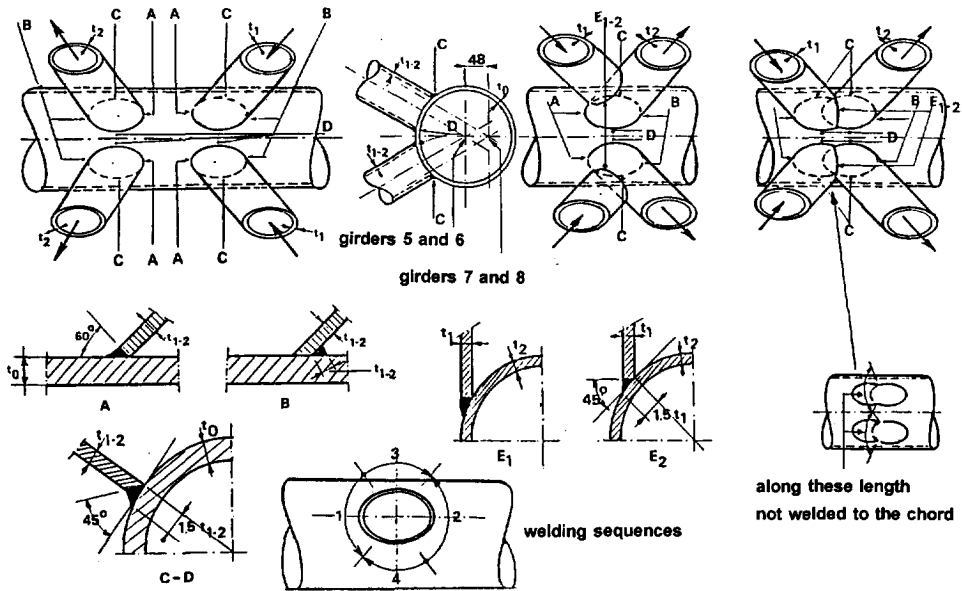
Welding details and welding sequences for the tested girders 5, 6, 7 and 8.
